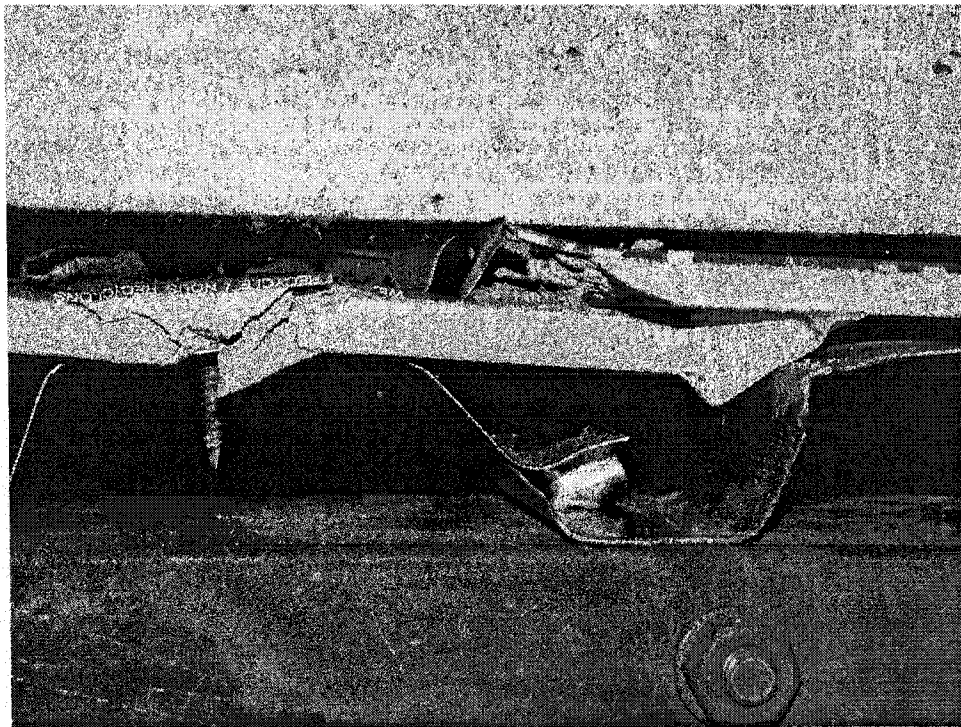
Cracking of gypsum board at the frame corner
